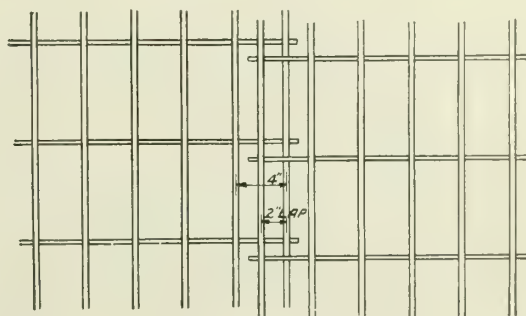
SHOWING ELECTRICALLY WELDED FABRIC AS IT ACTUALLY APPEARS WITH A SIDE LAP OF 2 IN.
